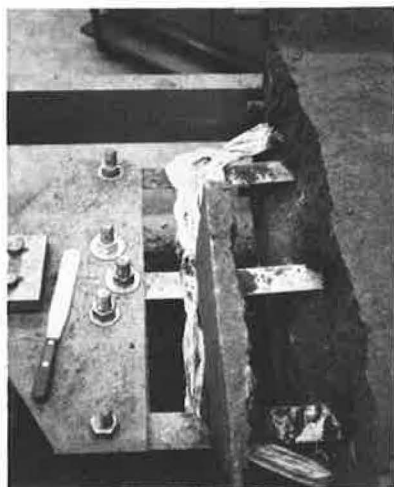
Cone-shaped failure in specimen with solid steel-plate reinforcement for test 7.
